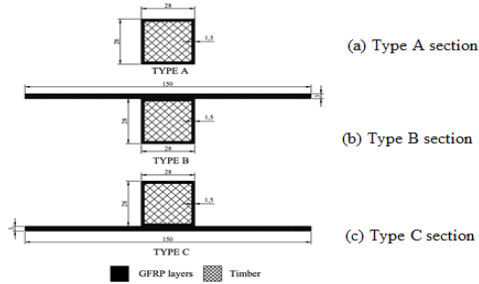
Composite timber-GFRP cross-sections and dimensions in mm
